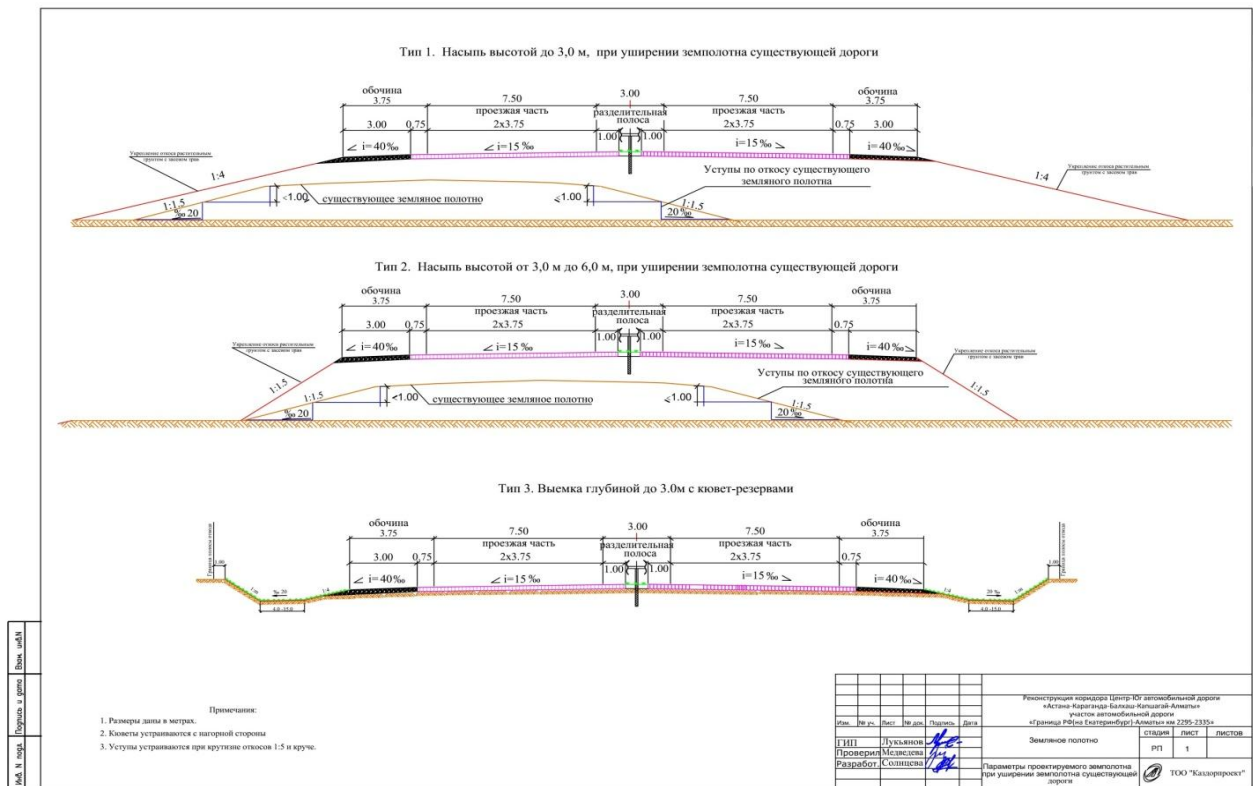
Typical transversal section of section I of the offered reconstruction and construction of additional two lanes of the existing road
